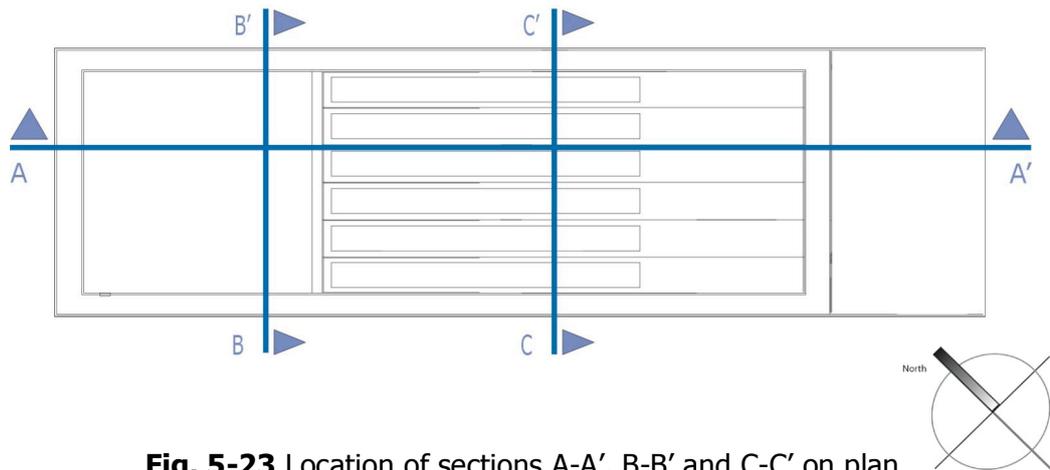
Location of sections A-A', B-B' and C-C' on plan
